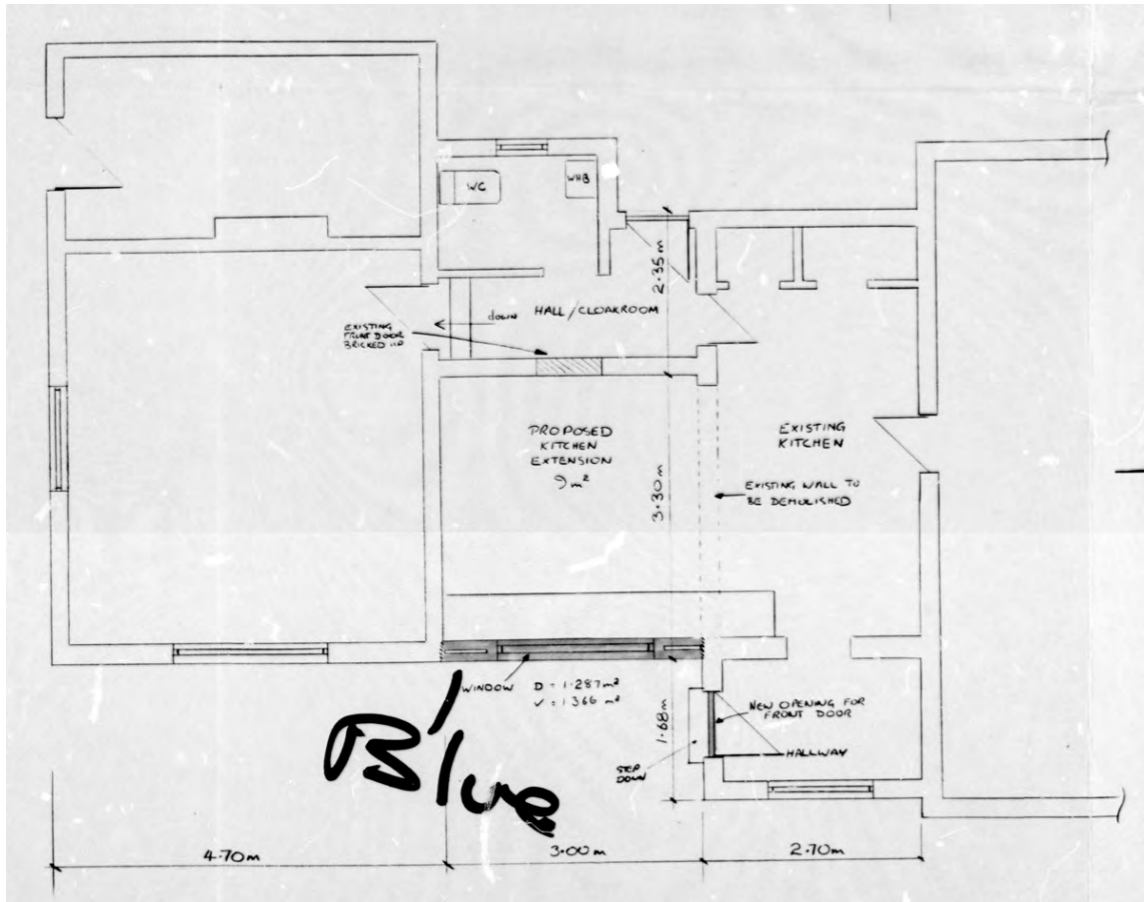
Previous approval REF: 82/P/0425 - Proposed ground floor plan (NTS)
